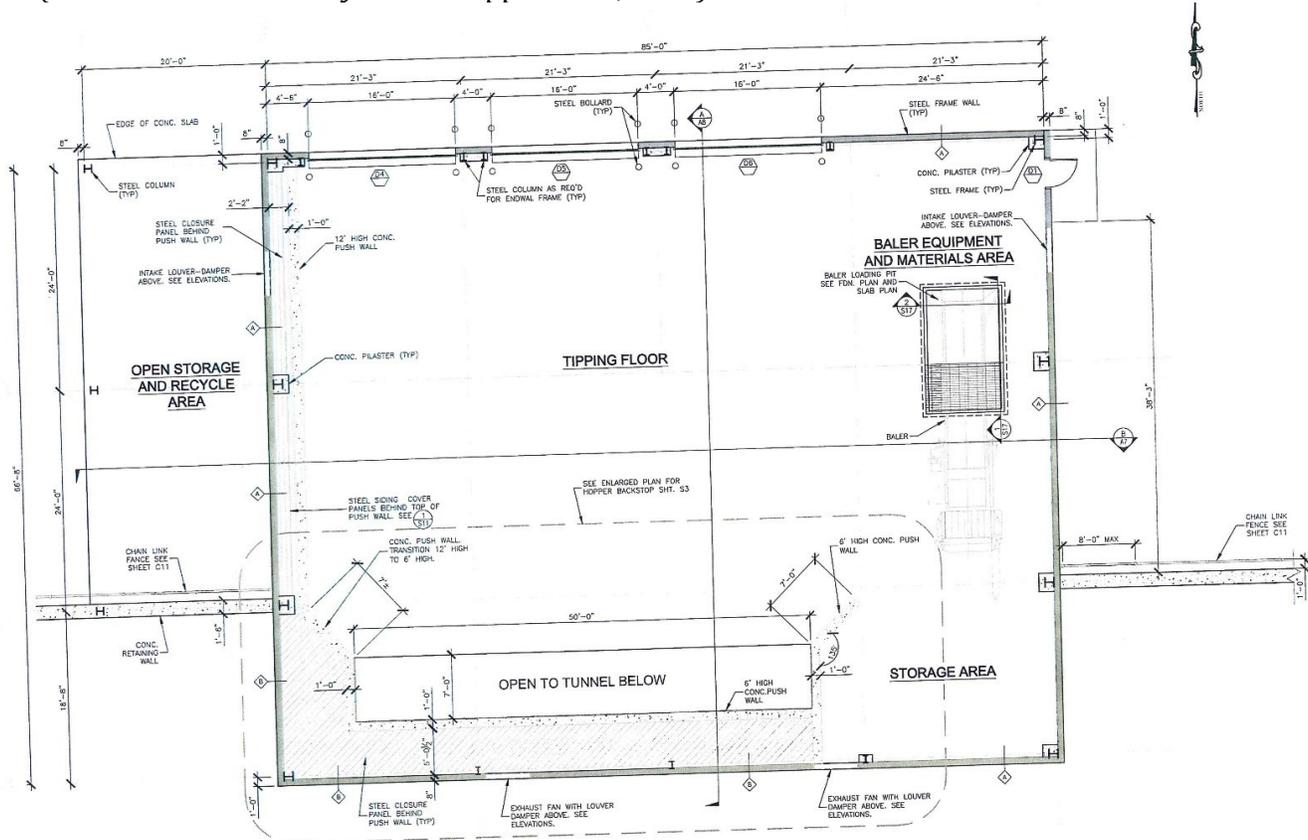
Upper Level Transfer Station Tipping Floor Plan
